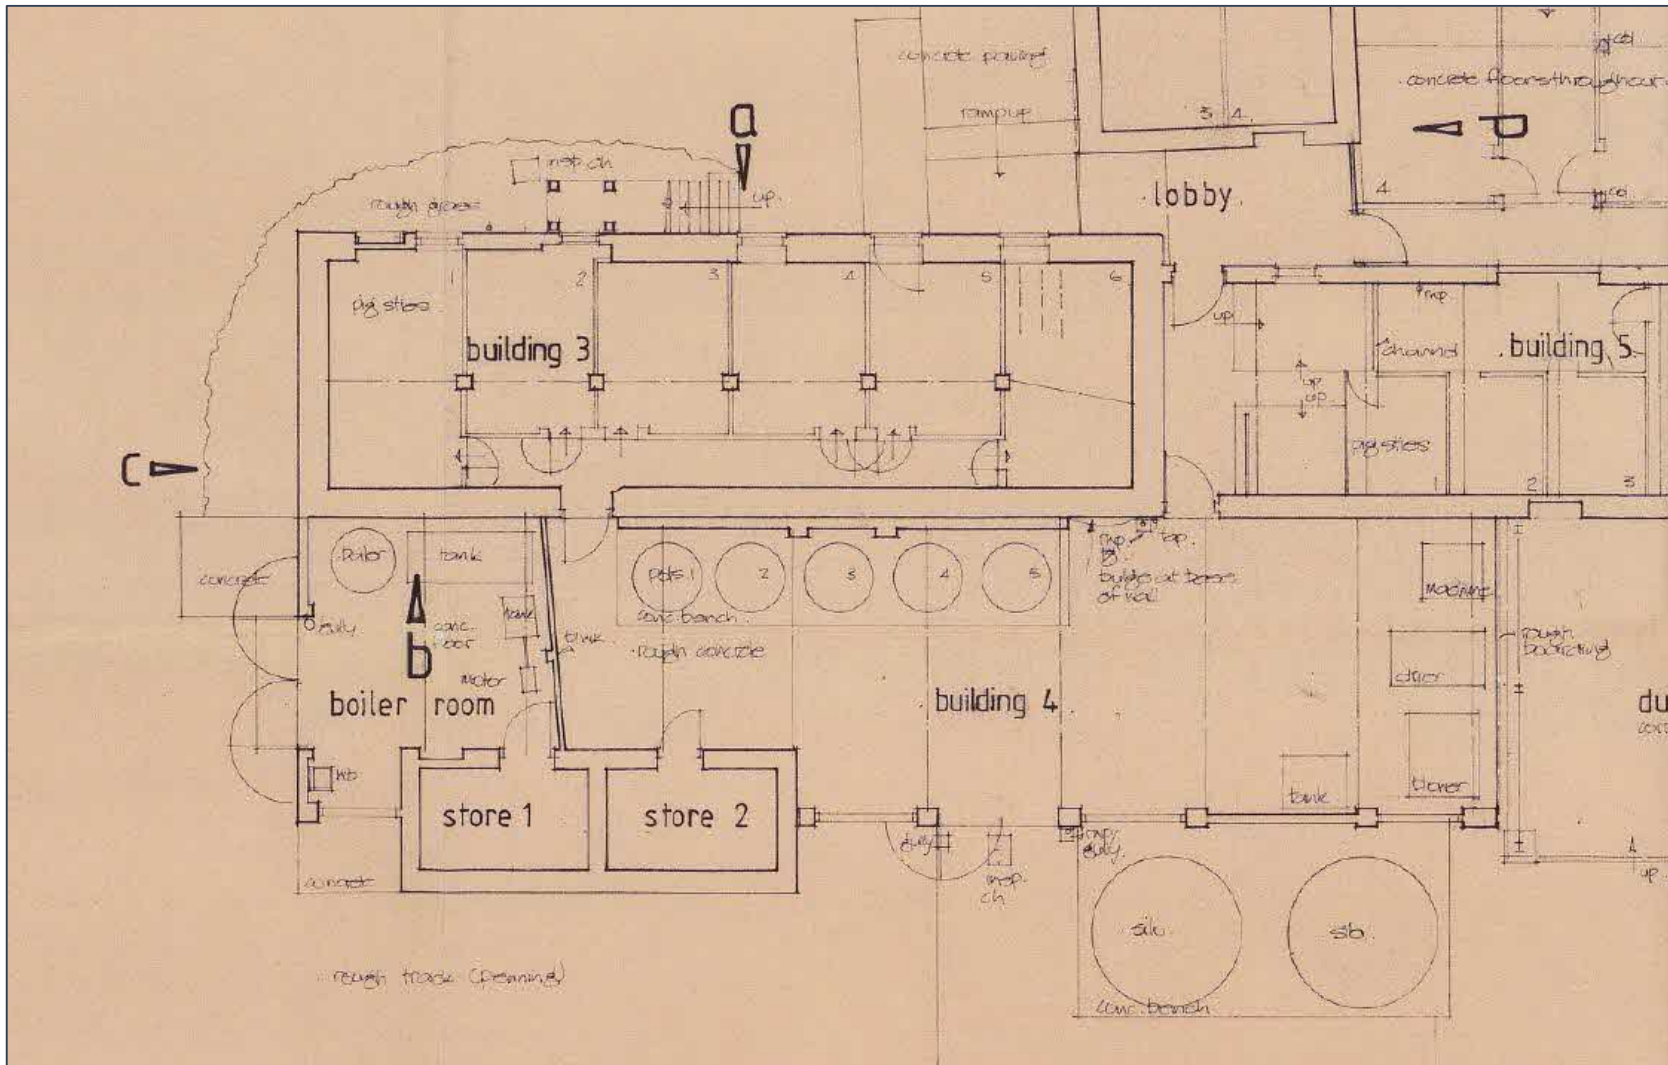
Enlarged image of existing ground floor plan 1988 application – note no rear door into kitchen and no windows on ground floor. Several tall pots against north wall with building 4 attached.
